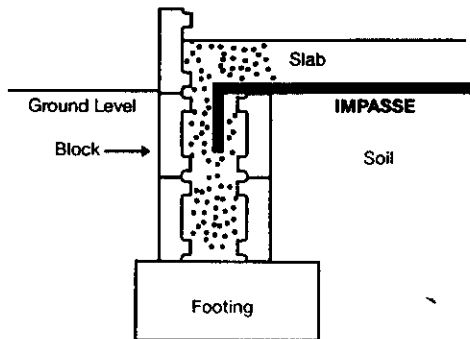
Shows Impasse Barrier installed in a hollow-block slab that will be filled with concrete.
